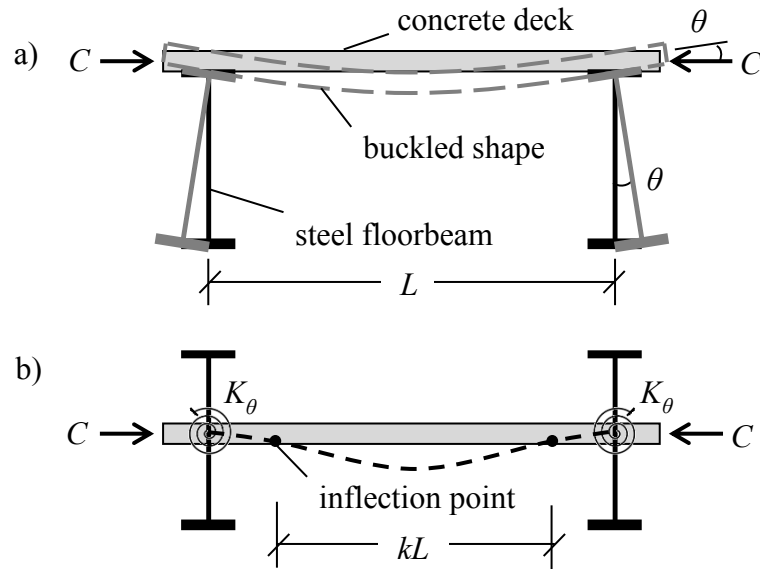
Deck slab instability: a) buckled shape; b) idealization with deck slab at floorbeam centroid.
